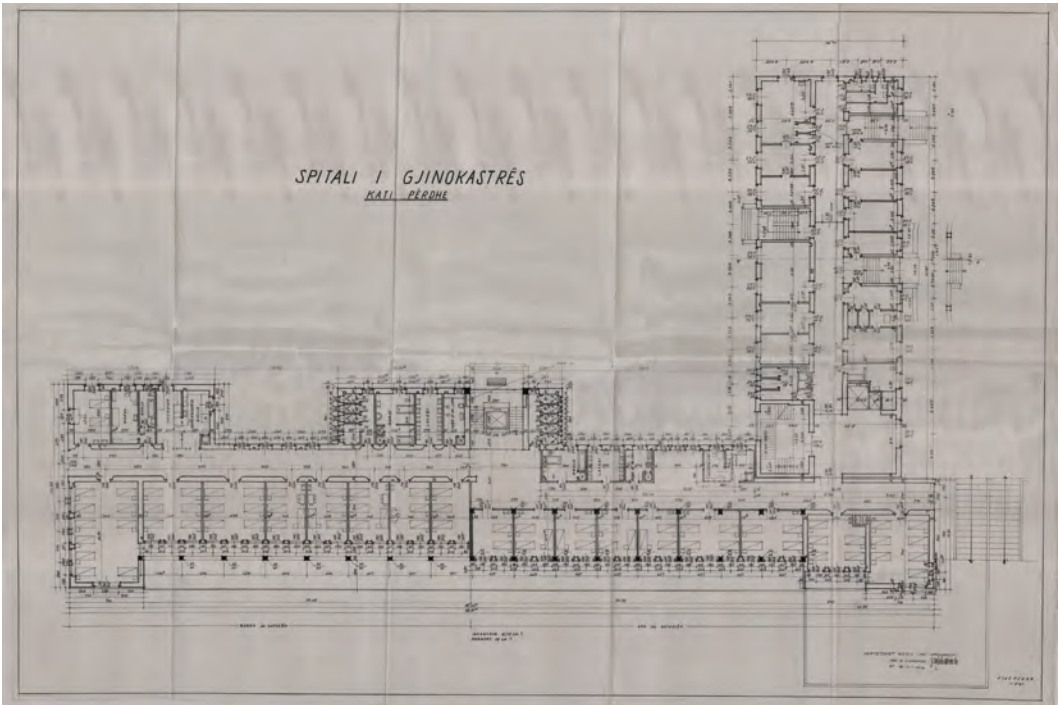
/ Skënder Kristo Luarasi, Ground Floor Plan of the Hospital of Gjirokastra, Final Version, 1949
